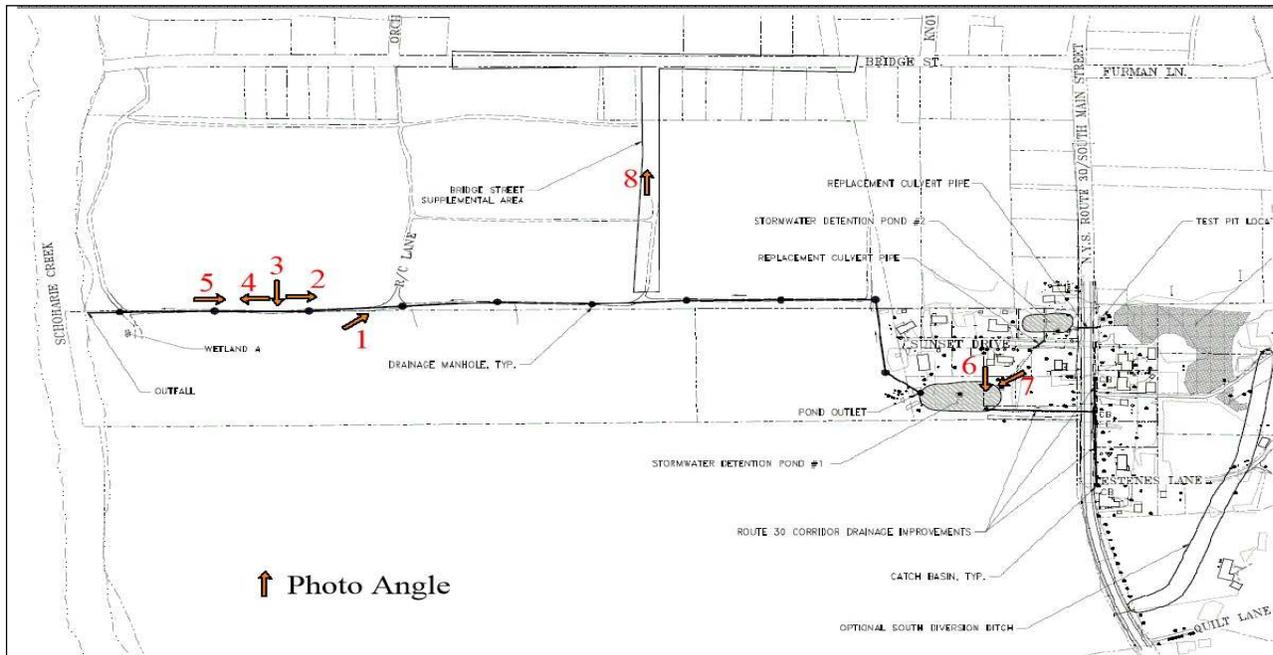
PROPOSED SITE PLANS ALONG WITH PHOTOGRAPH LOCATIONS.
